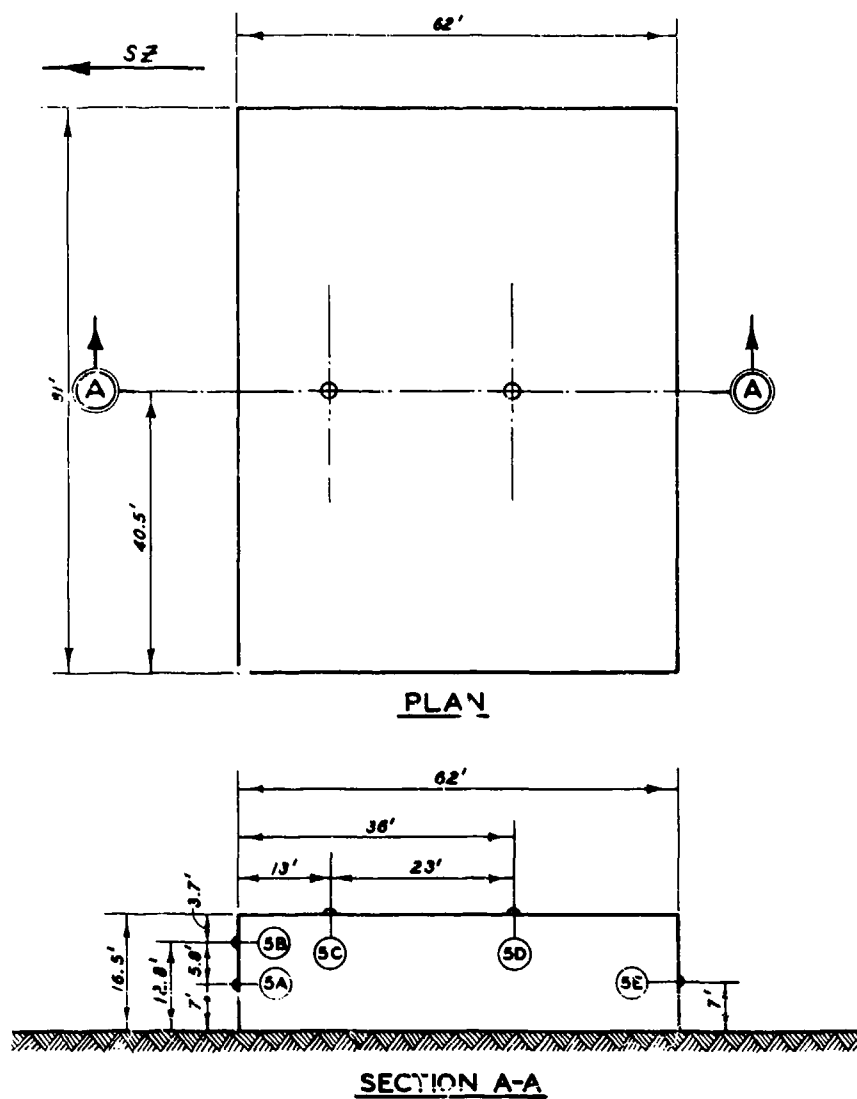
Plan, elevation, and gage geometry for Station 1312, Site Janet.
